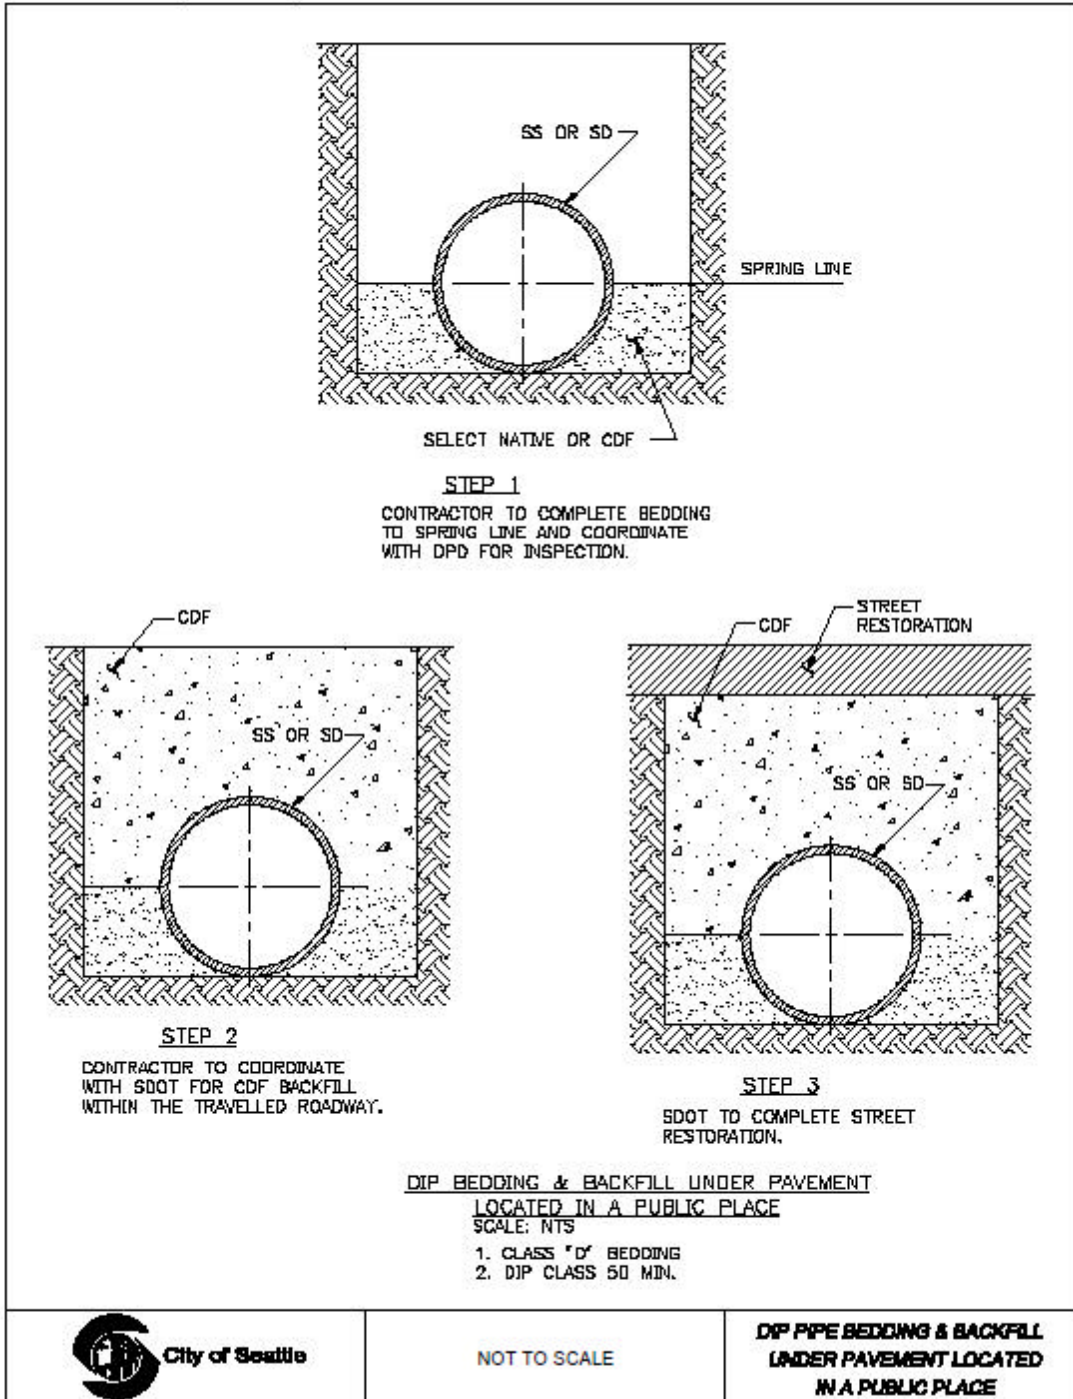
Rigid Pipe Bedding & Backfill Under Pavement Located In A Public Place
